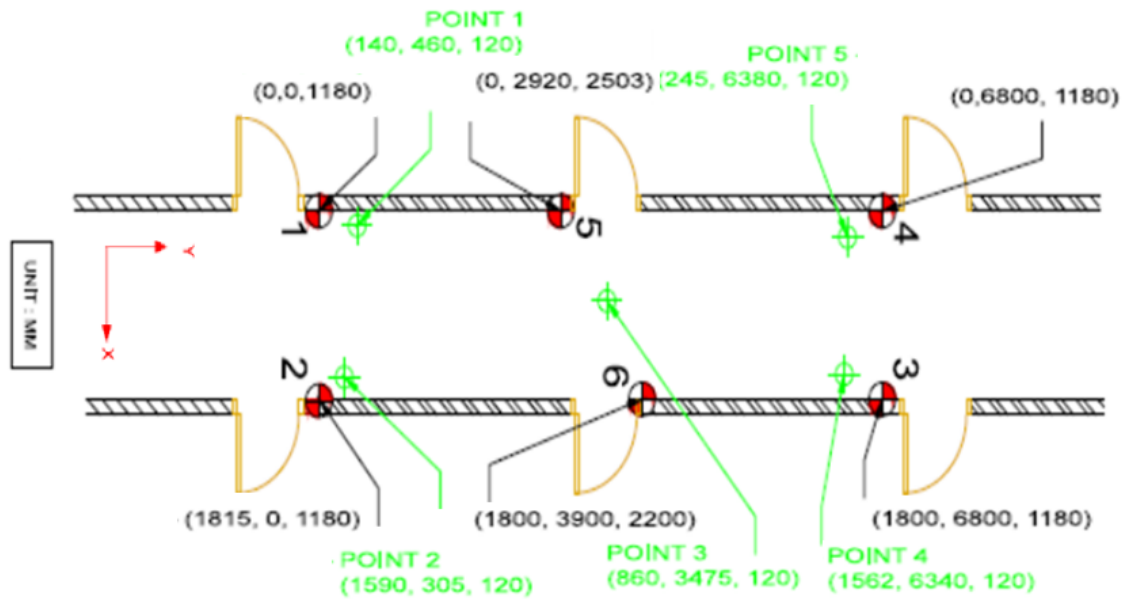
Floor Plan of the narrow corridor for UWB positioning test.
